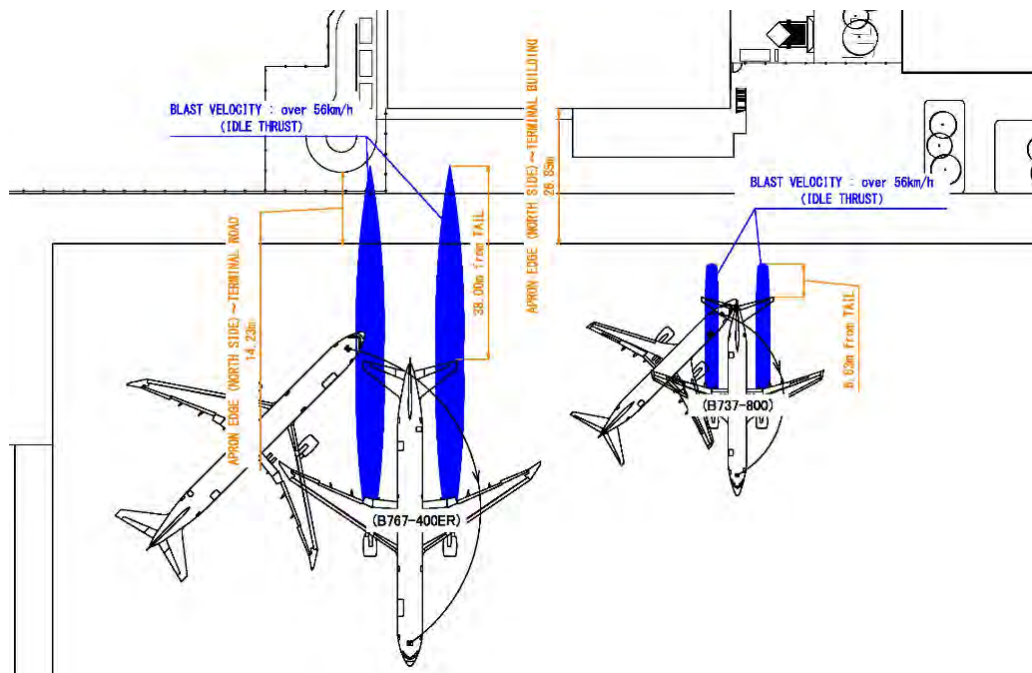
Aircraft Parking Spot Layout Plan in the Apron
